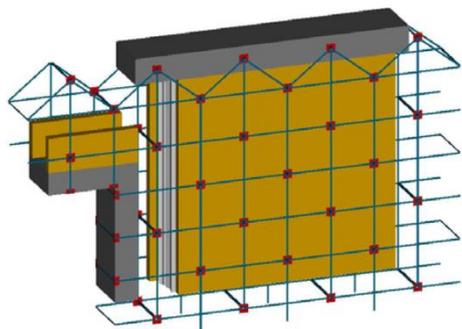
CAM arrangement in a wall with a door and a R/C upper lintel.
